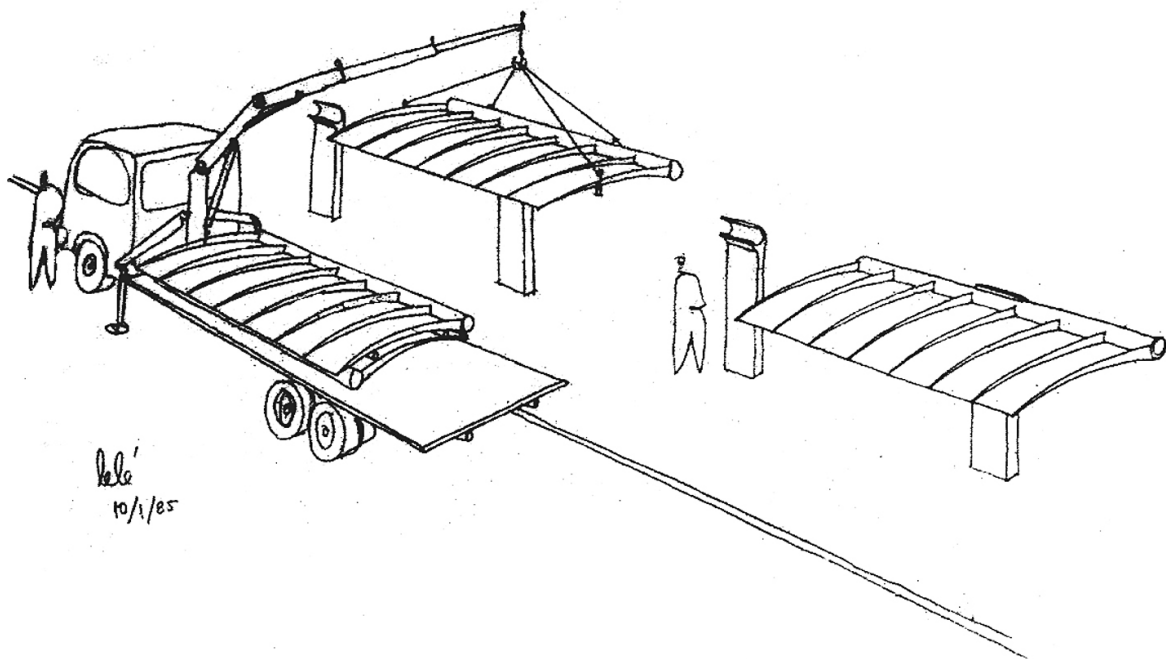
Rio de Janeiro bus shelter model in *argamassa armada*. Design and drawing by Lelé, Rio de Janeiro, 1985. Assembling process on site with the help of a Munck truck. Arquivo João Filgueiras Lima, Salvador
